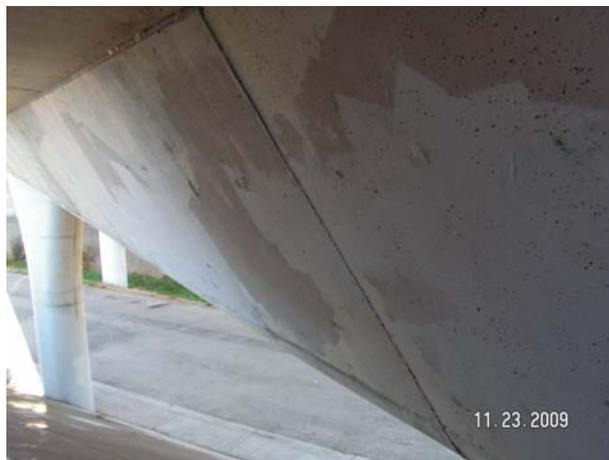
Bridge No. 27-0090R brown fiberboard at bridge abutments
